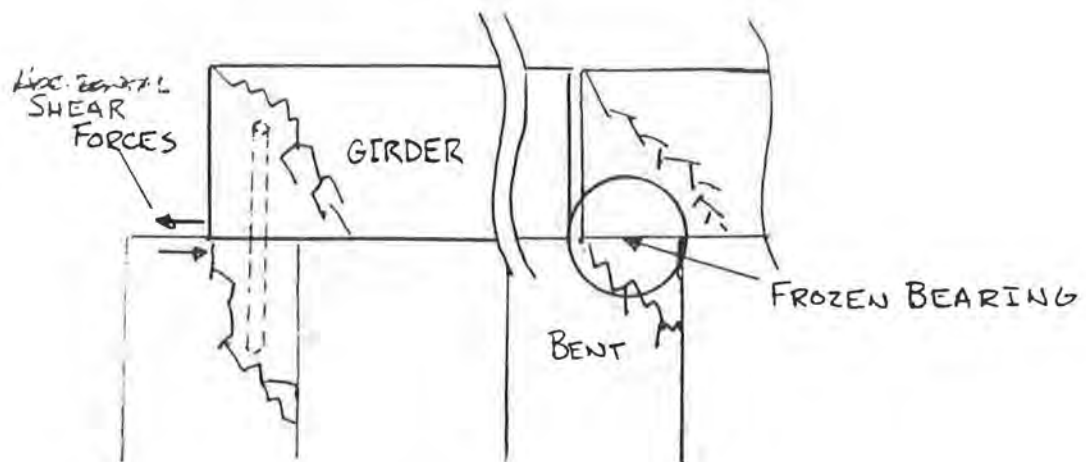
Sketch Illustrating Girder End and Bent Cap Damage Due to Frozen Bearings.
